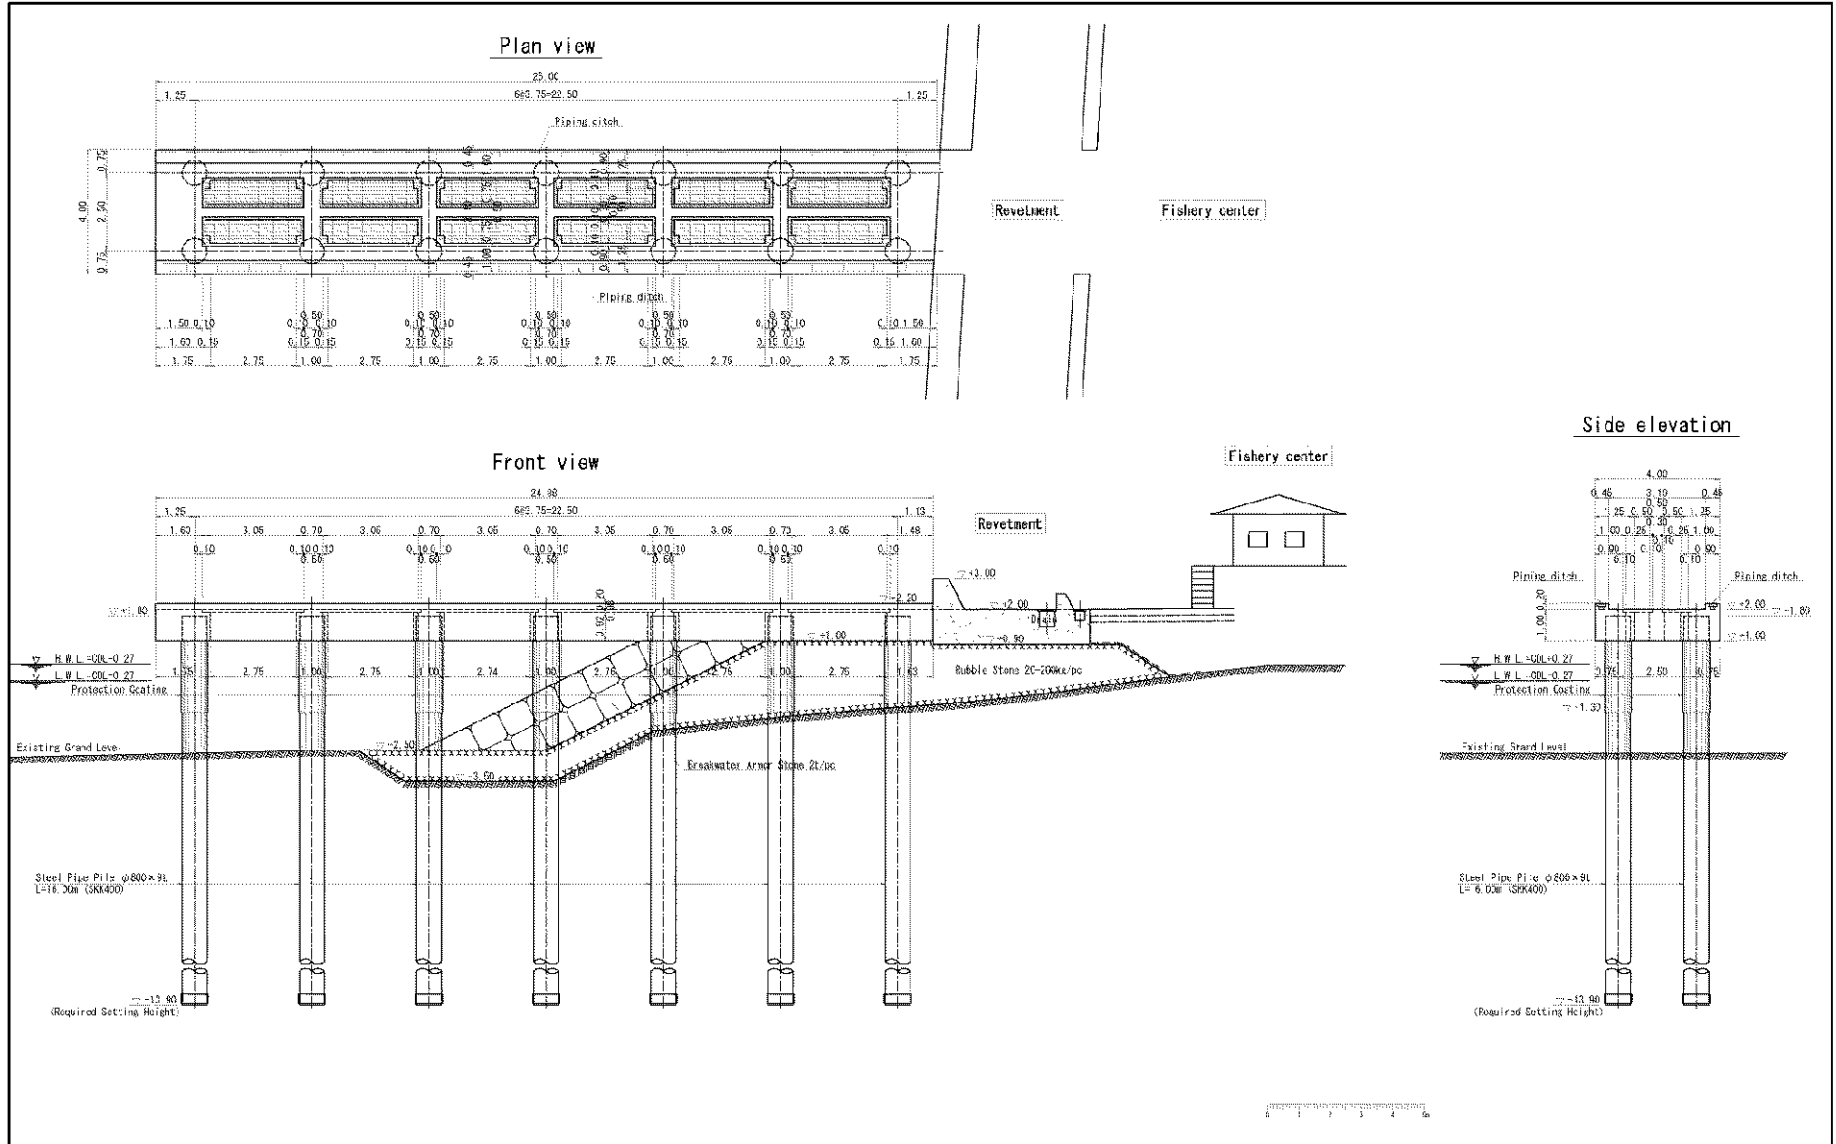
(4) Fishery Jetty Access Part (Plan, View and Cross Section)
